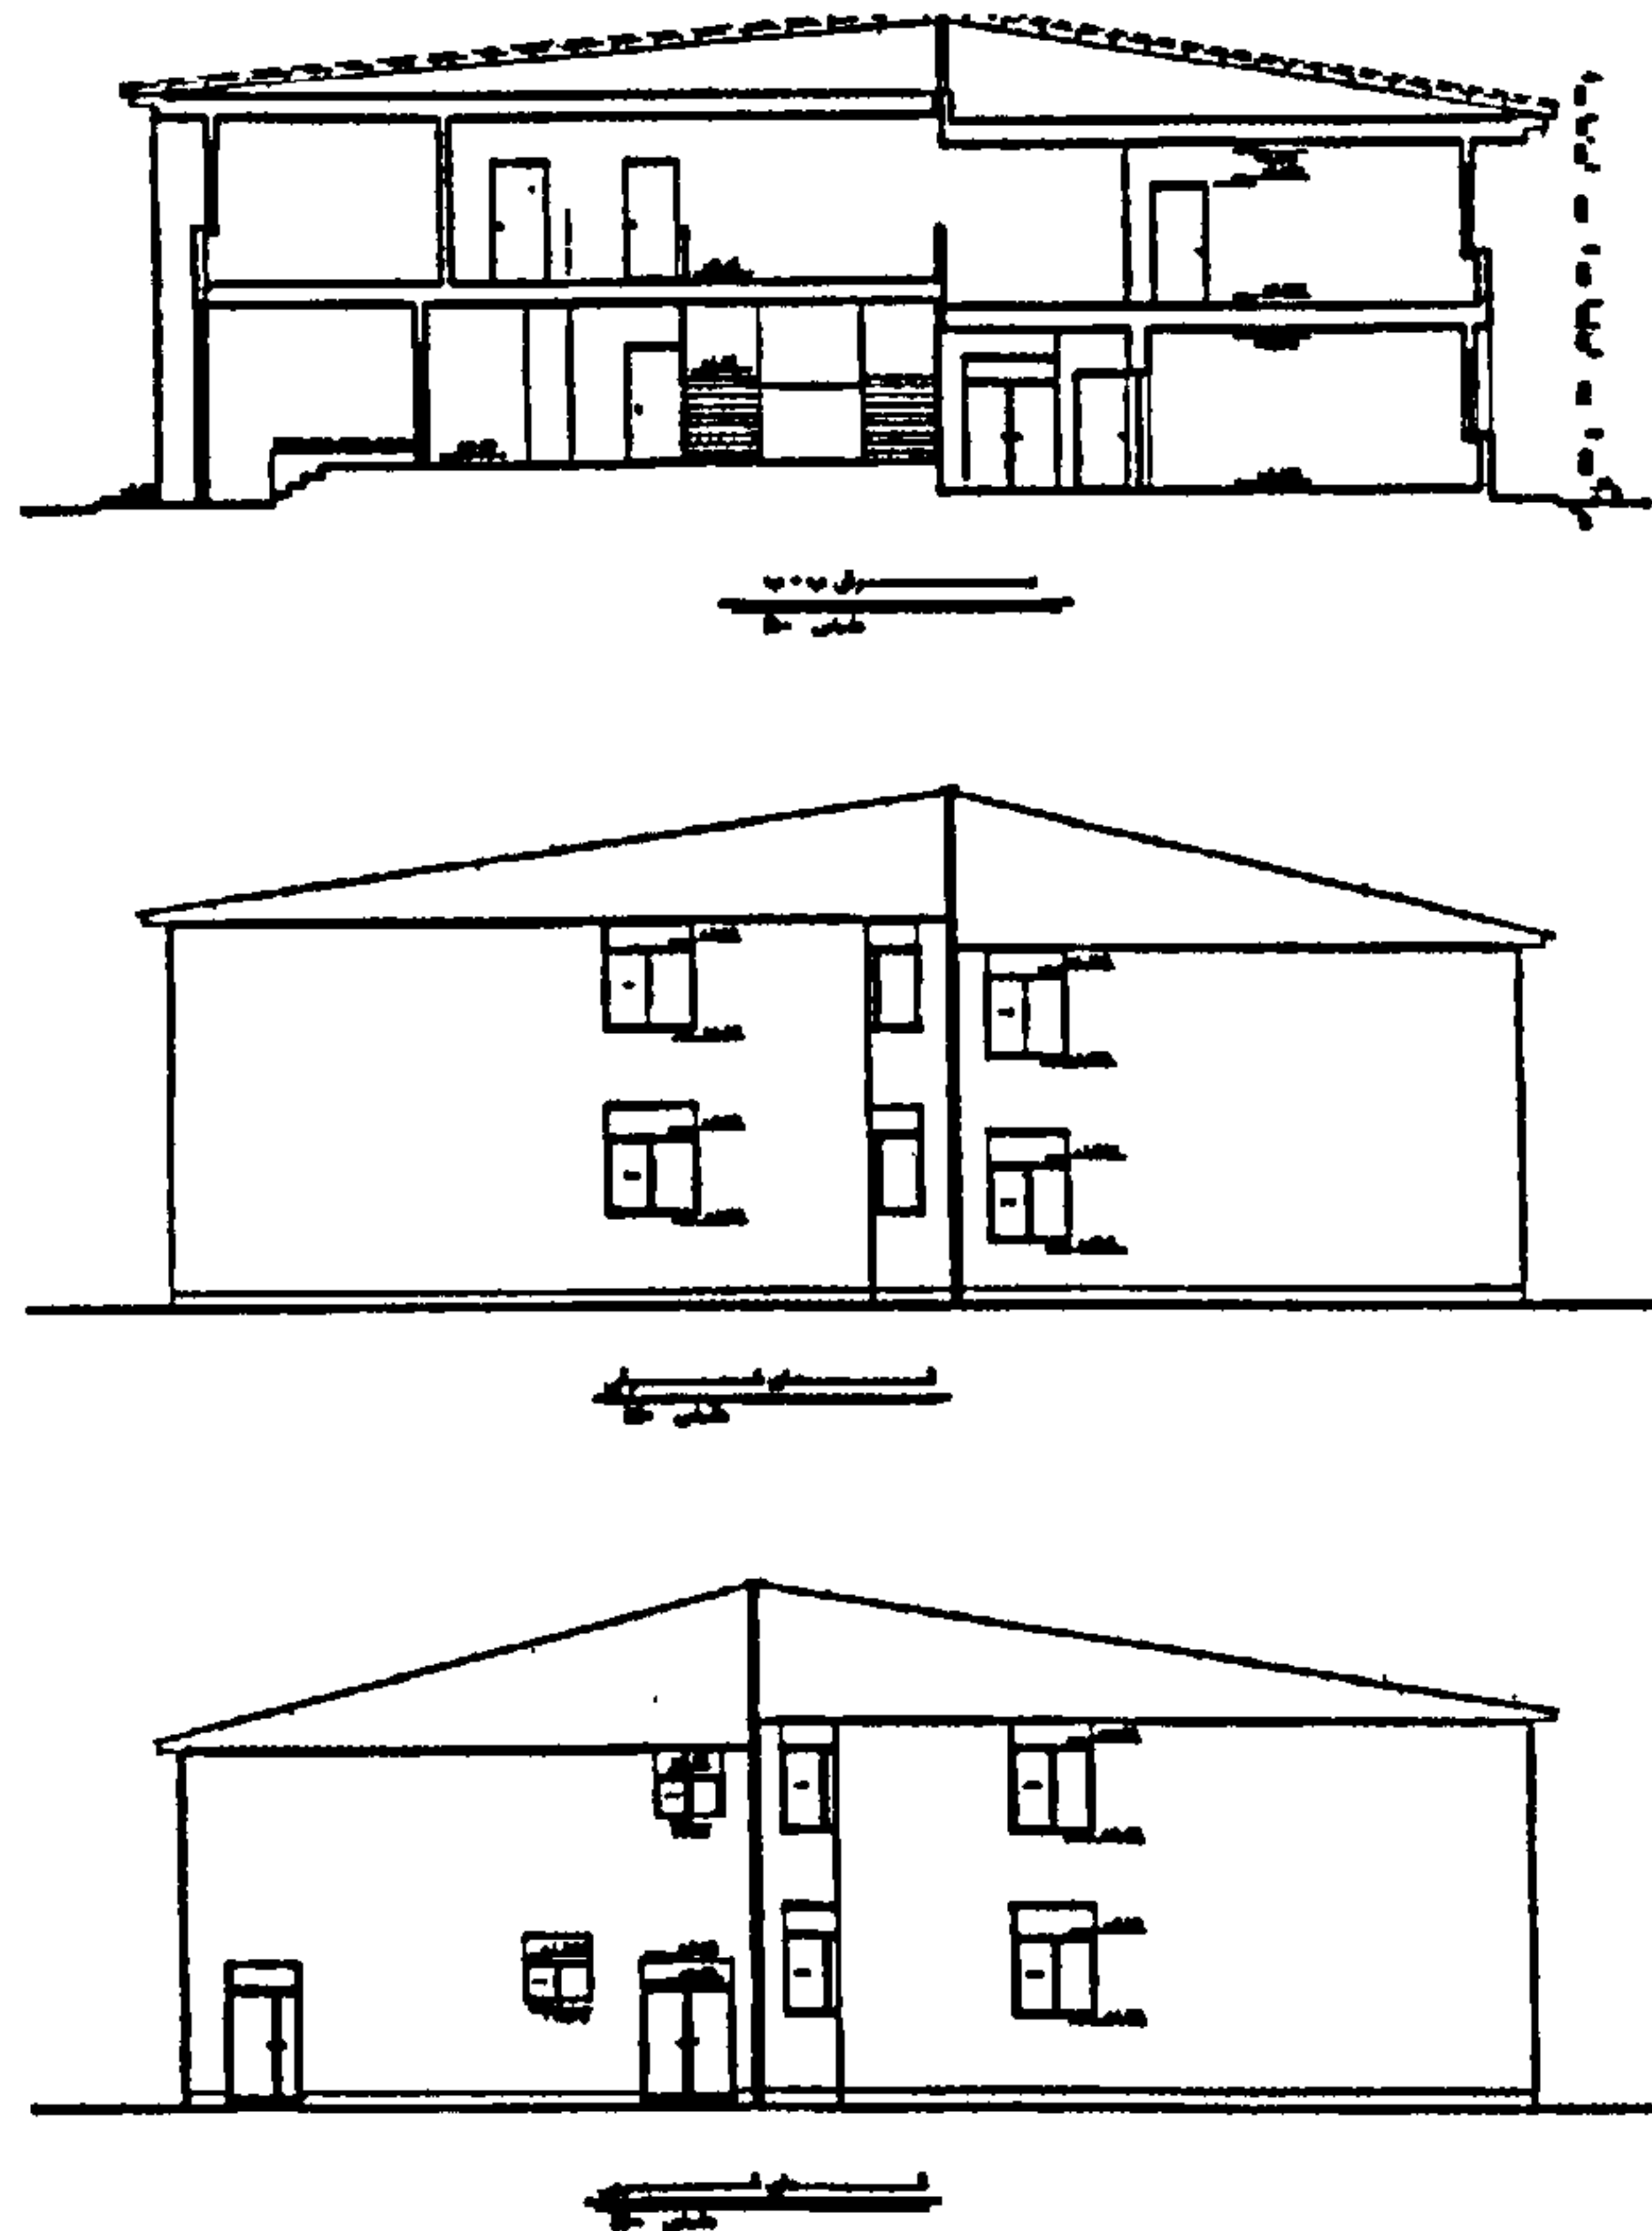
The section B-B & east and west elevations of a secondary school with 9 classrooms (Number 10)
